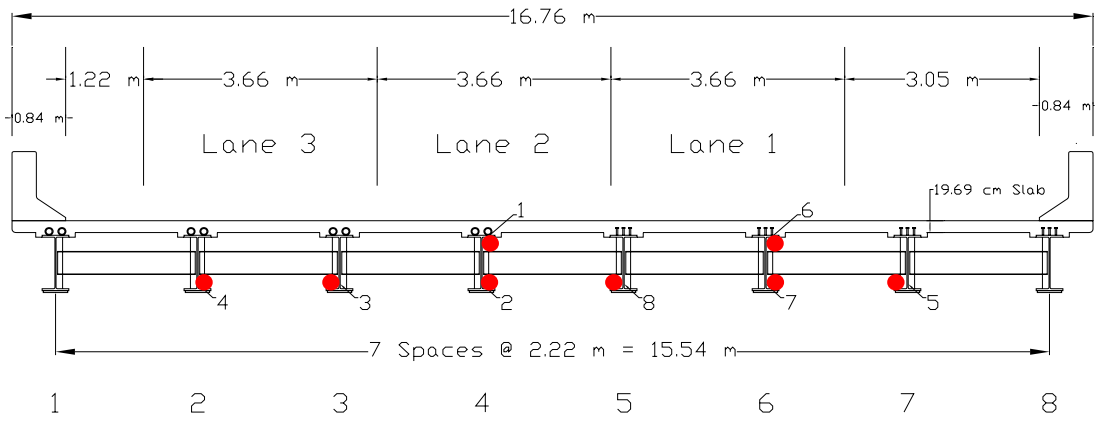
Cross-section view of the bridge and sensor layout (red dots).
